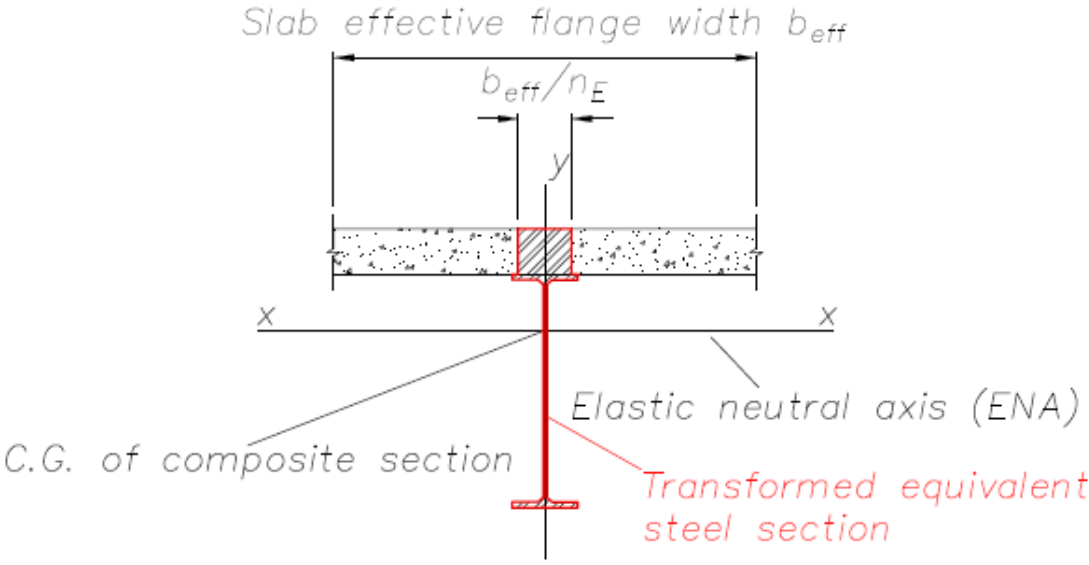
Transformed section of a steel-plate girder with concrete slab per Luo (2016)
